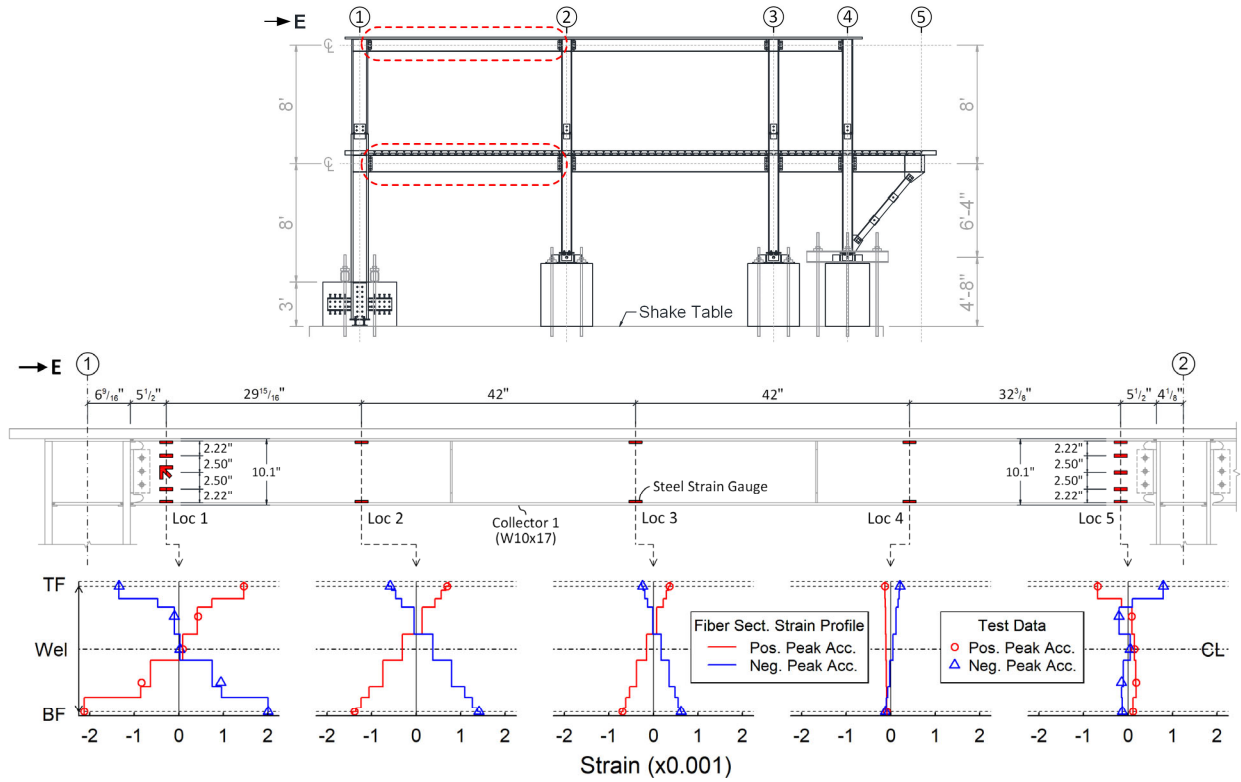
Test 2B-5: Fiber Section Strain Profiles of North Roof Collector 1
